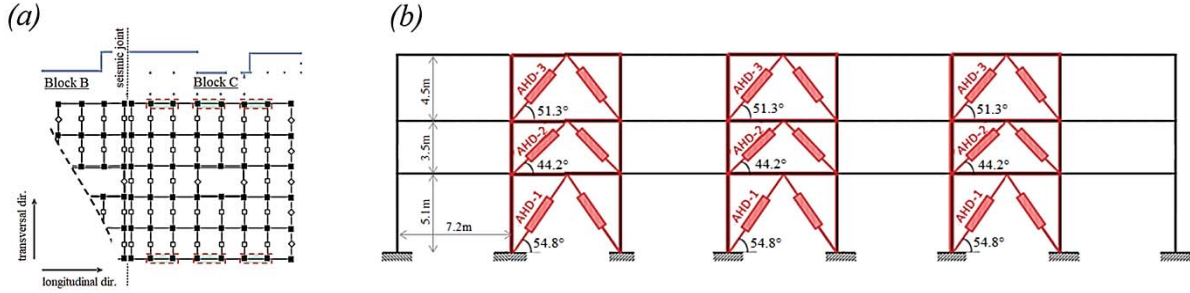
Spatial arrangement of the AHD units: (a) in-plan location; (b) vertical layout.
